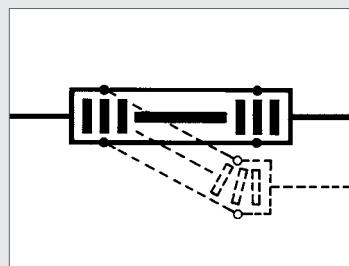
Lateral expansion joint, flexible on all planes. Deflection in anchor plane
